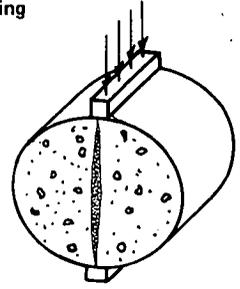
Cylindrical splitting test specimen failing under compressive load.
